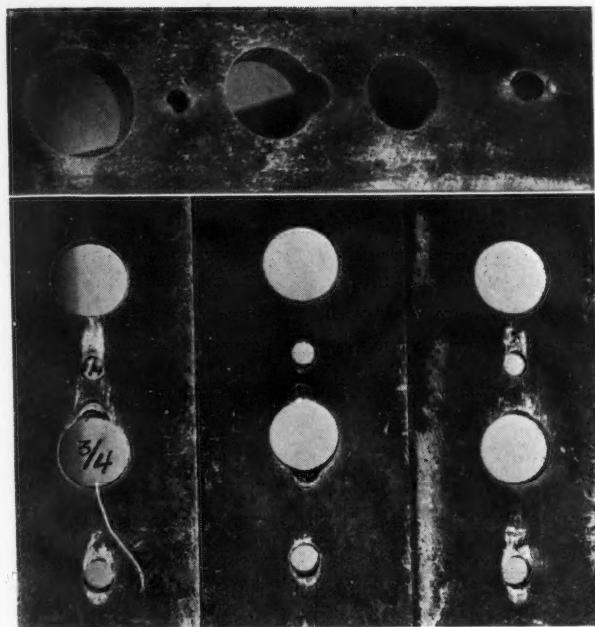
(Top) The lower bar of the upper set of Fig. 2. The smallest hole had eleven $\frac{3}{16}$ -in. iron rivets broken in it, the next ($\frac{1}{4}$ -in.) had 42 iron rivets and 10 bolts. The badly marred hole is the $\frac{5}{16}$ -in. The other holes had wood pins only
